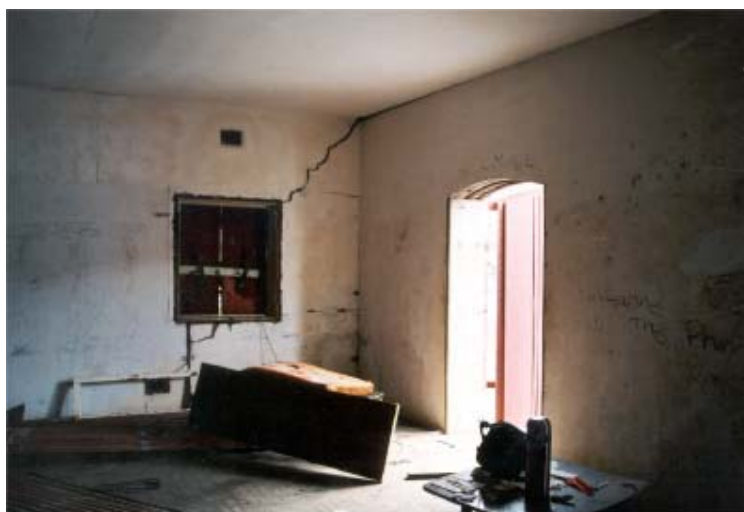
Cracking to internal walls of receiving shed, 2001
